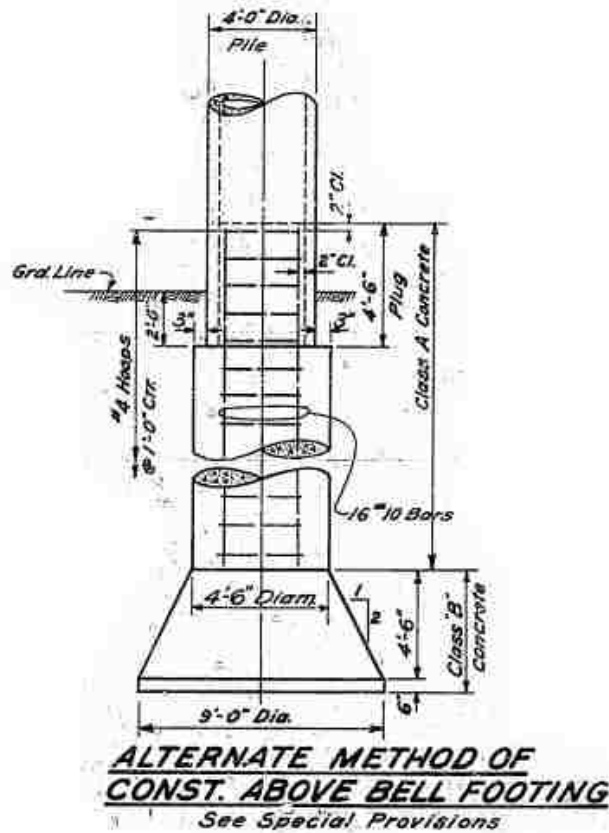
Alternative method of pile-column construction for East Galer St. Bridge
